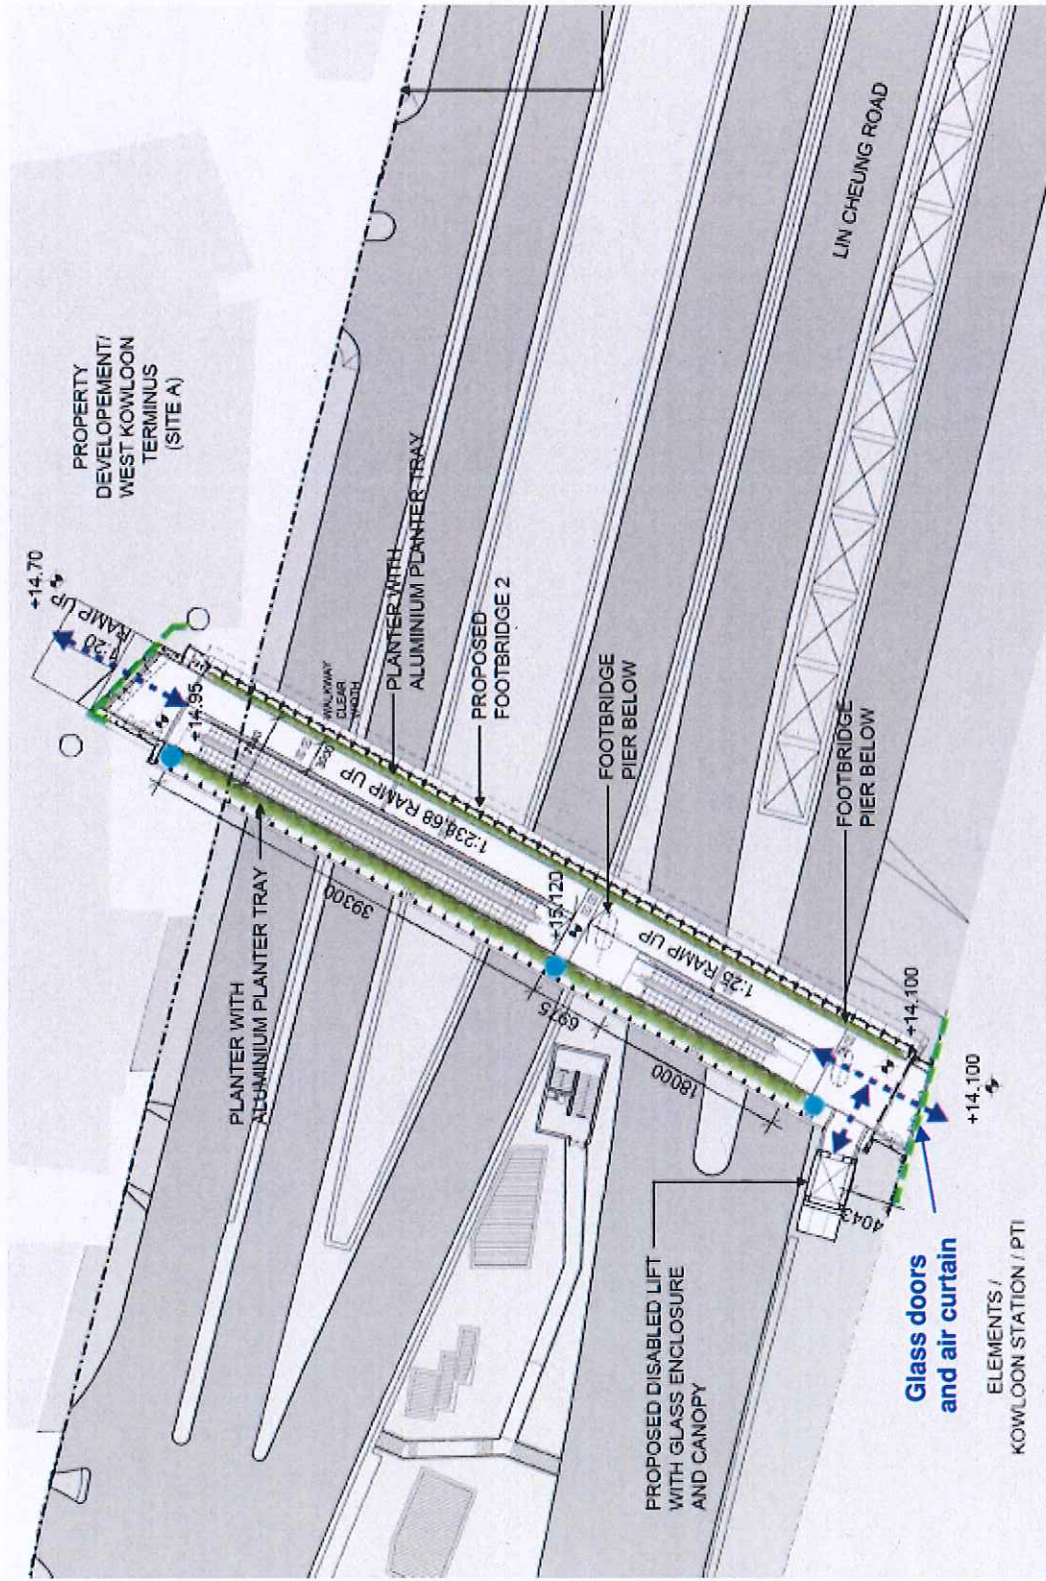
FB1 FOOTBRIDGE LEVEL PLAN
